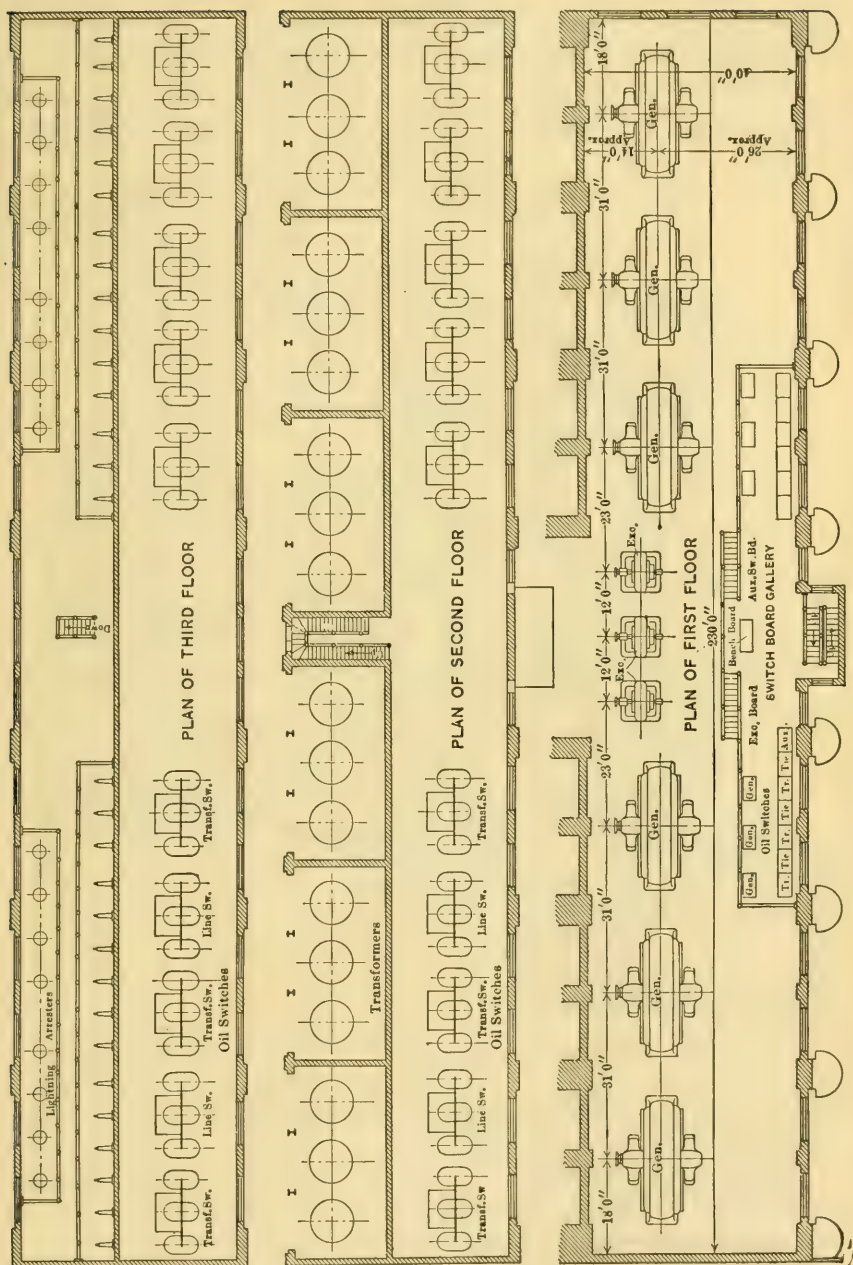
A.—Floor Plans of Hydro-Electric Power-house with Limited Space. (For cross-section see Fig. 100.)
